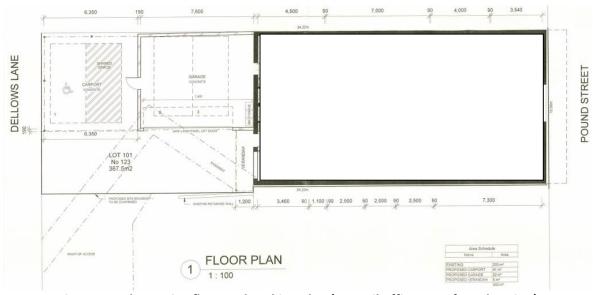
Alternative floor and parking plan (Council officers preferred option)
